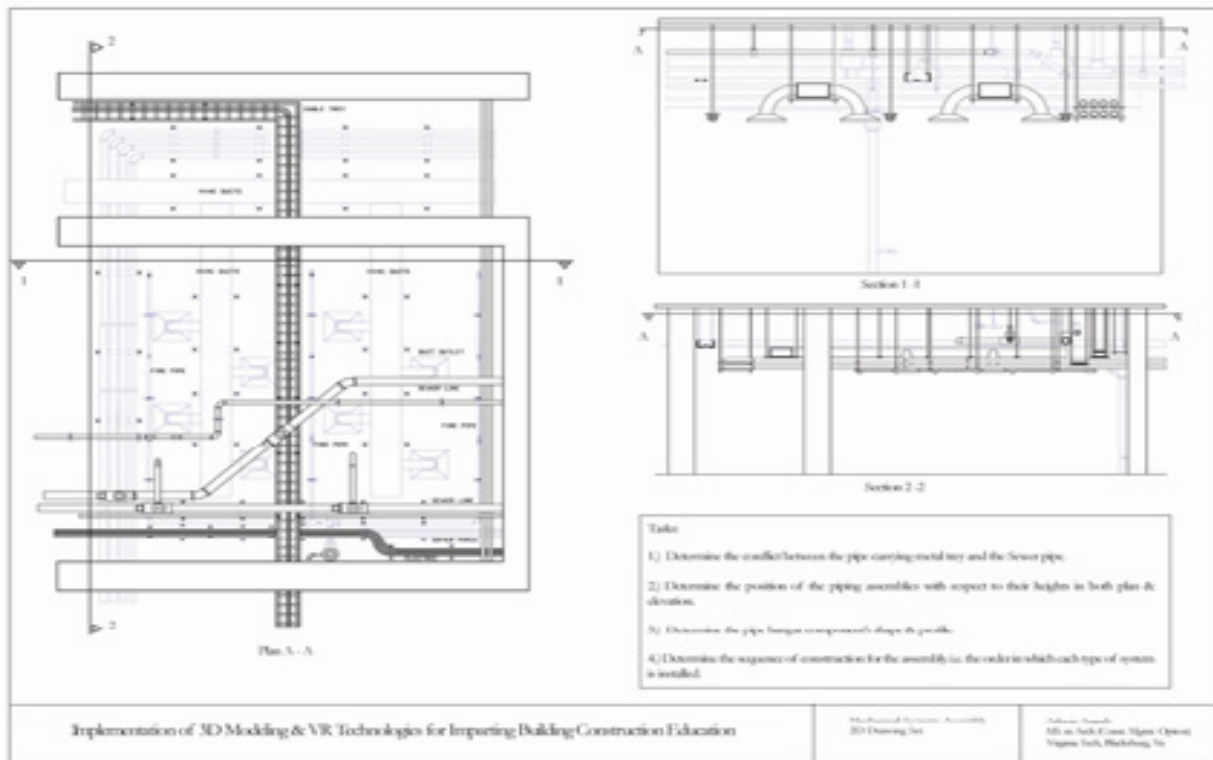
EXAMPLE 2D DRAWING (MECHANICAL ASSEMBLY DETAIL)
